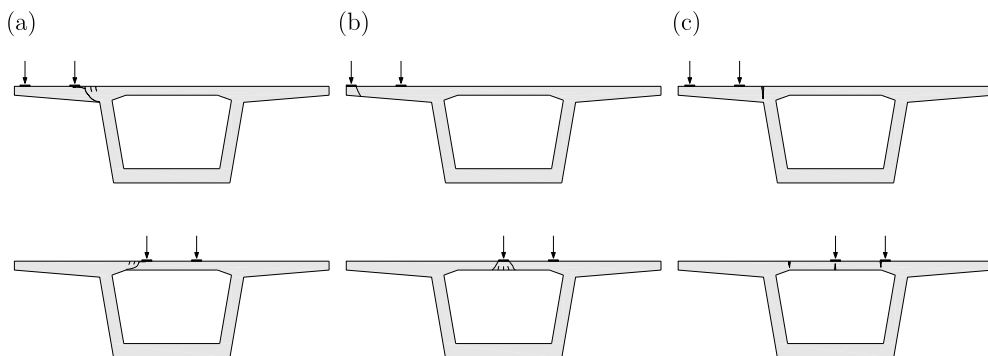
Failure modes of bridge deck slabs: (a) shear; (b) punching shear; and (c) flexural mechanism
